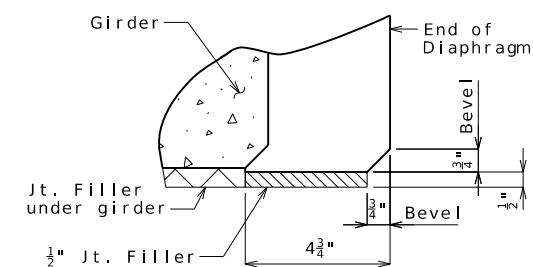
DETAILS OF CONCRETE DIAPHRAGM AT INTERMEDIATE BENTS NO. 2 & 3
